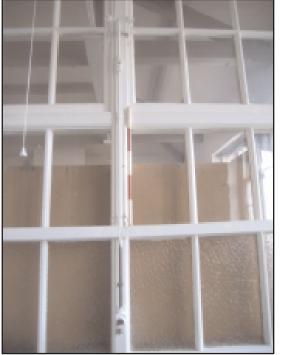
Detail of device for opening upper window panes (Classroom 1) looking east-north-east, 0.5m scale
